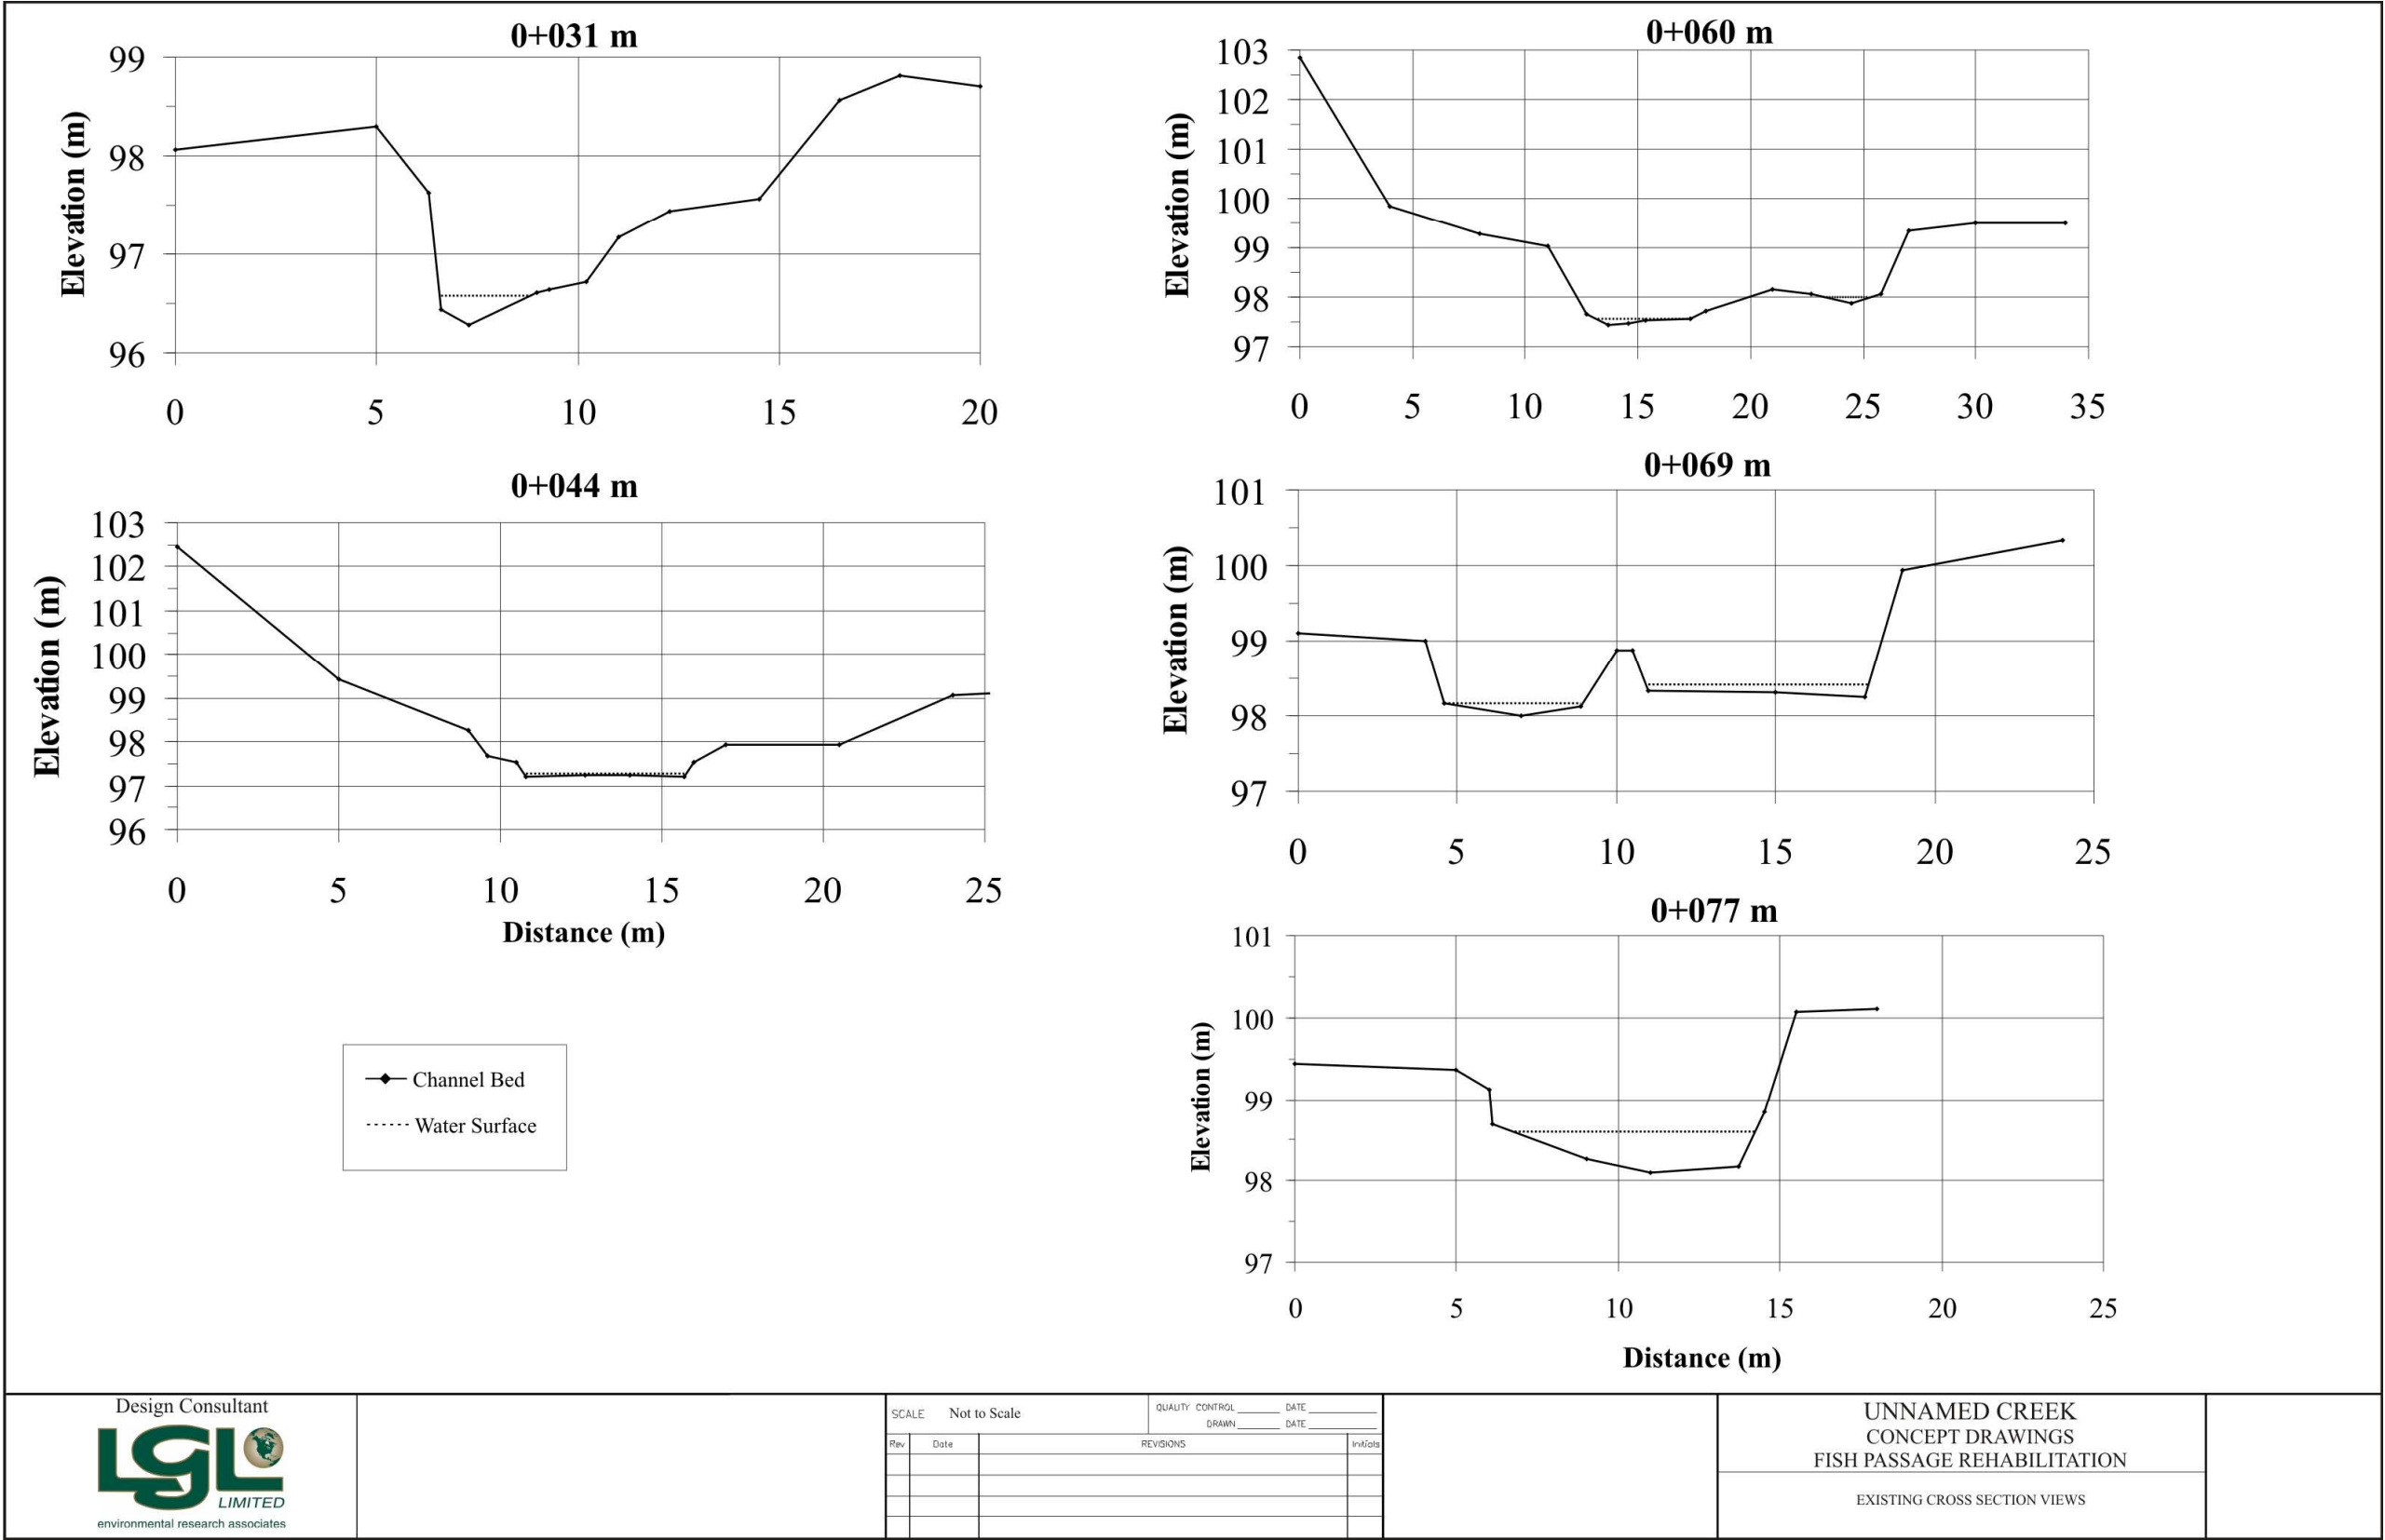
Existing cross sections of Unnamed Creek adjacent to the culvert crossing on Road 190.
